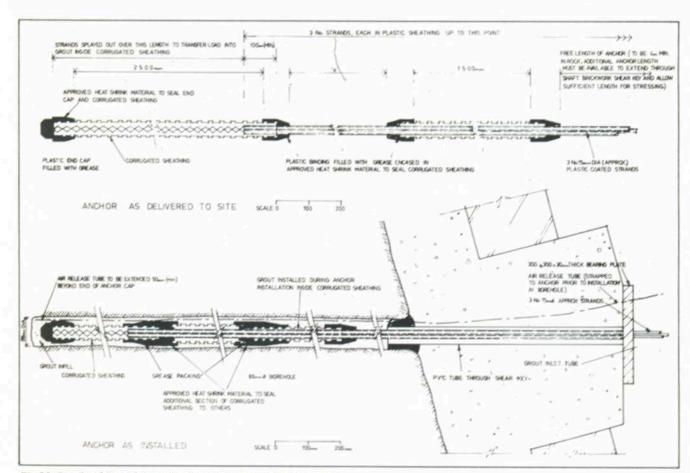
Details of Special "articulated anchor", used in Shafts 8 and 9, Summit Tunnel, (Extracted from James Williamson & Partner's Drawing)
